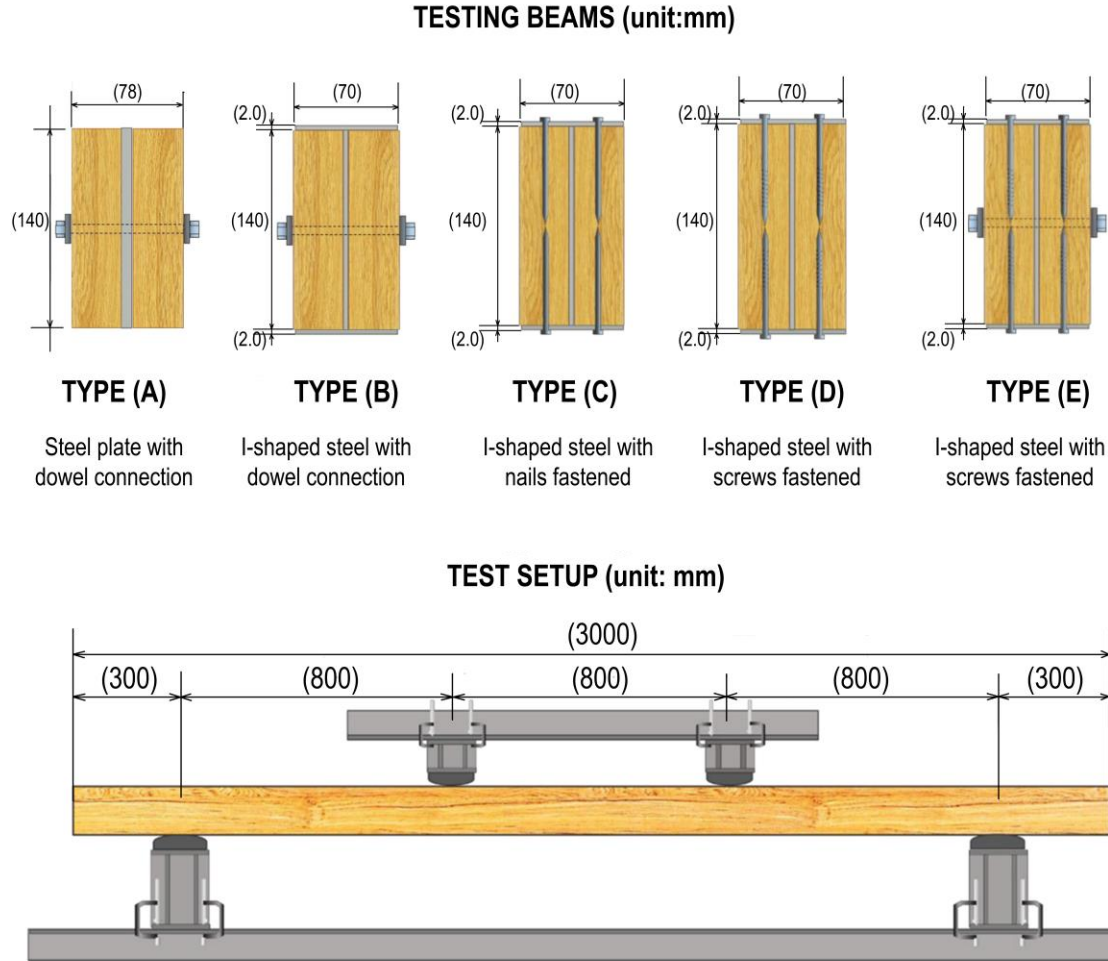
Flexural tests on timber beam specimens, reinforced with steel and various mechanical connections, such as nails, bolts, and combinations of both, conducted by [5]
